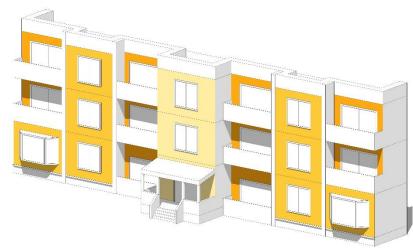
Apartment Building Type Building Off-Set Design Details
